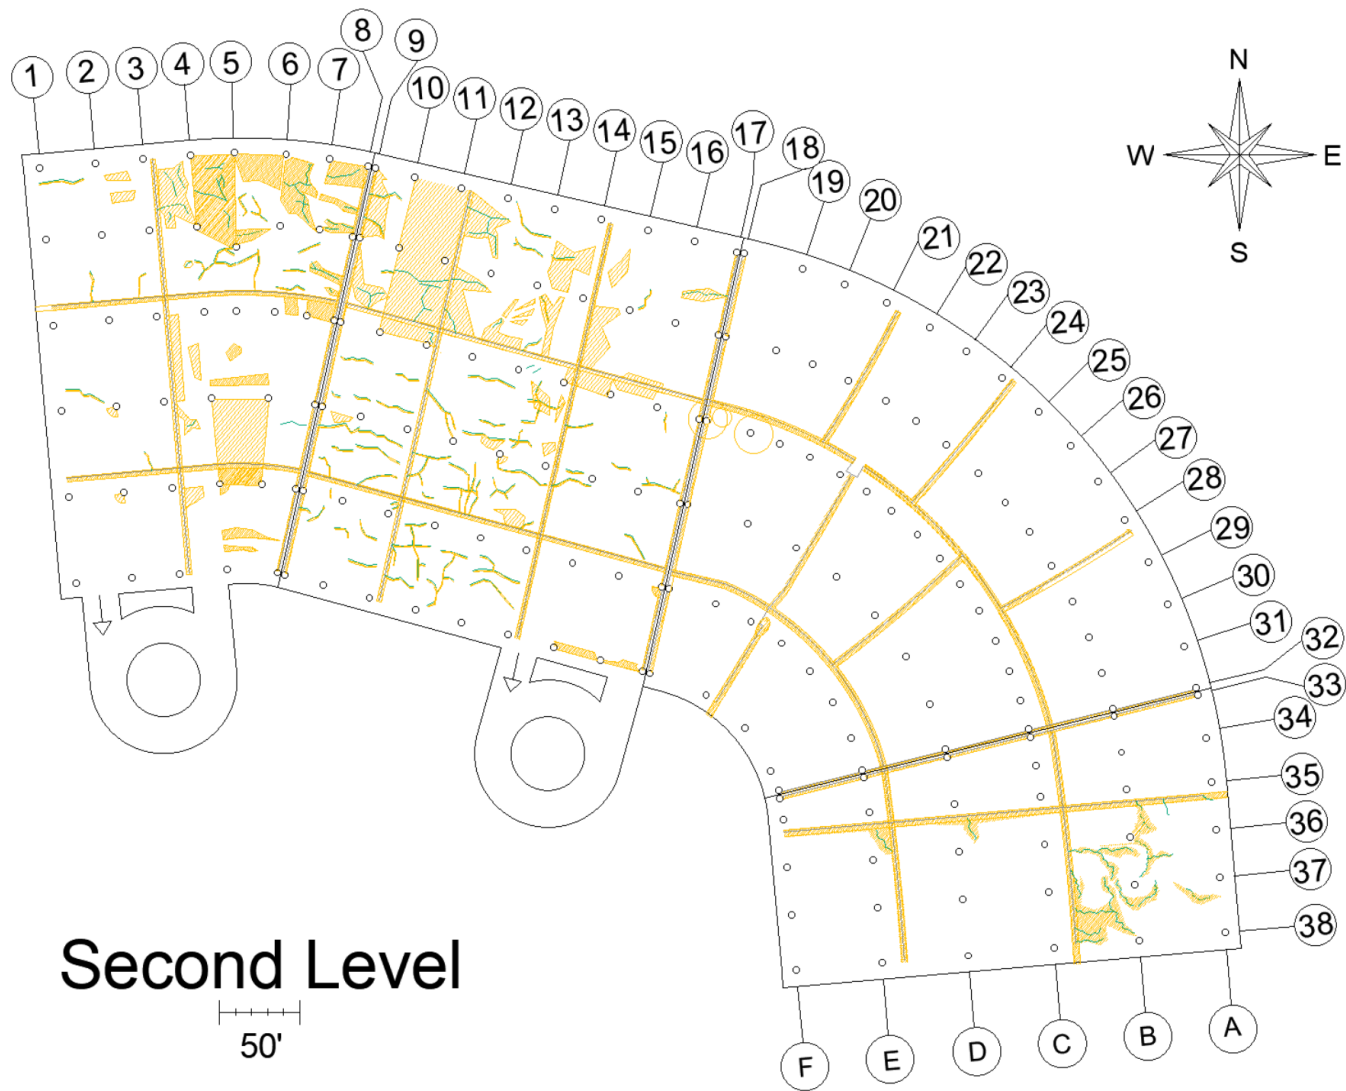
Crack map of the second suspended, reinforced silica fume concrete slab with green bottom-up cracks, yellow zones of efflorescence, and gray un-cracked epoxy-filled construction joints.
